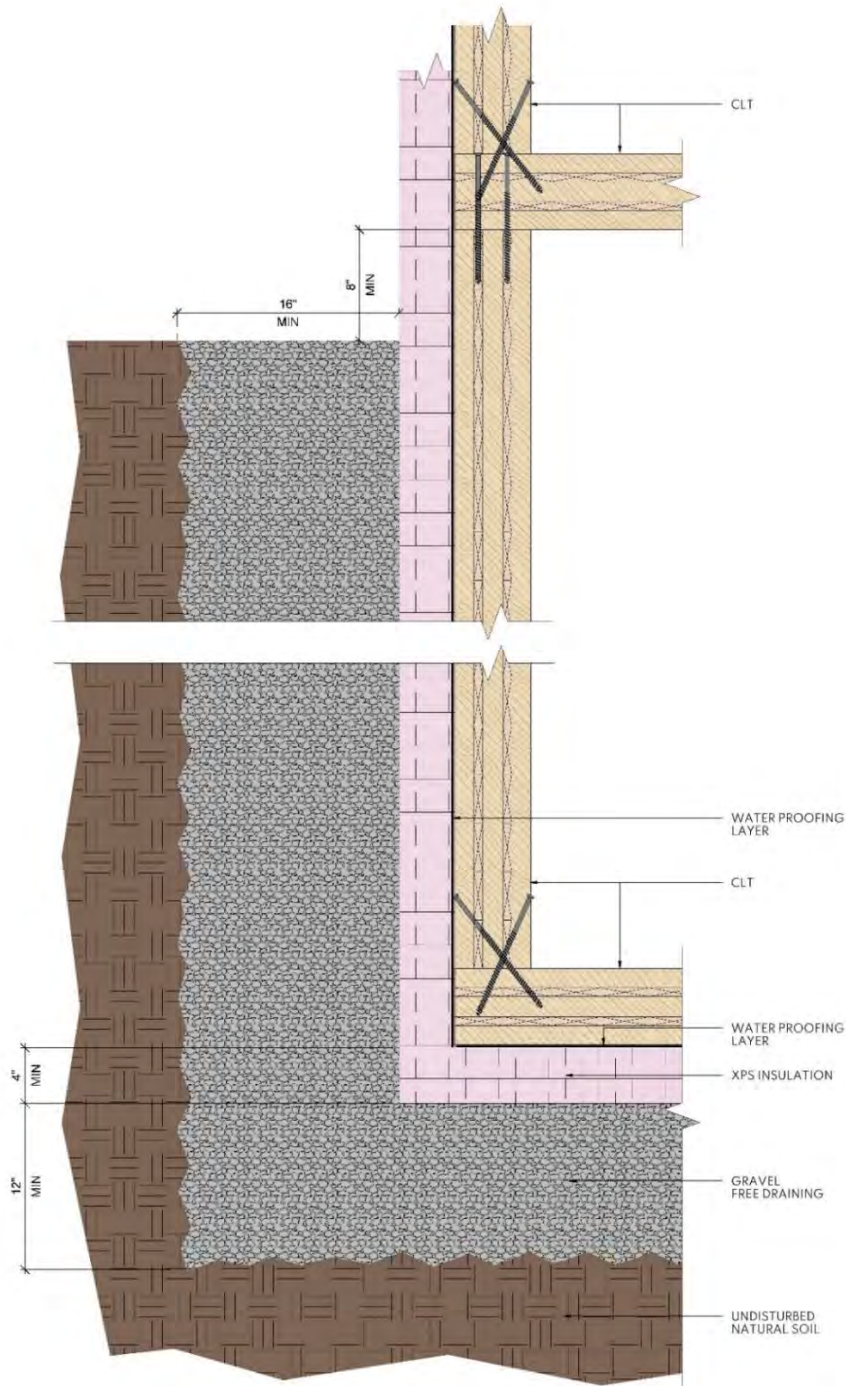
MT CLT slab and exterior load-bearing wall detail for buildings with a full basement.
